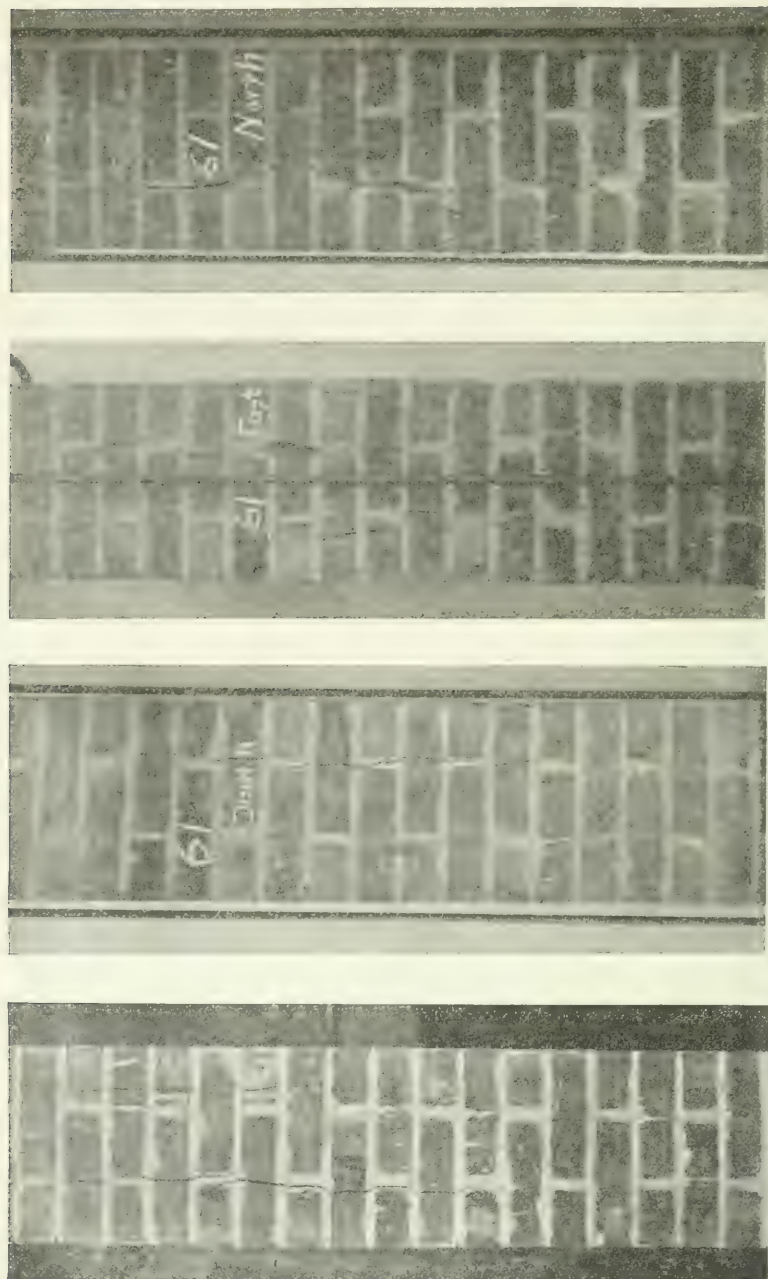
VIEWS OF BRICK COLUMN No. 61 AFTER TEST SHOWING CRACKS FORMED ON EACH OF THE FOUR FACES.
